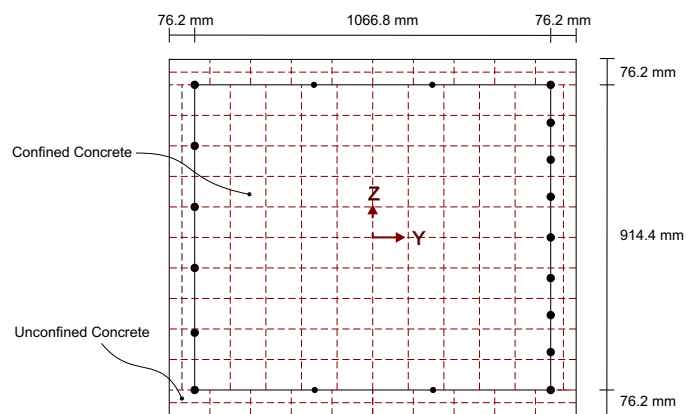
Fiber Discretization of Reinforce Concrete Bent Beam.
